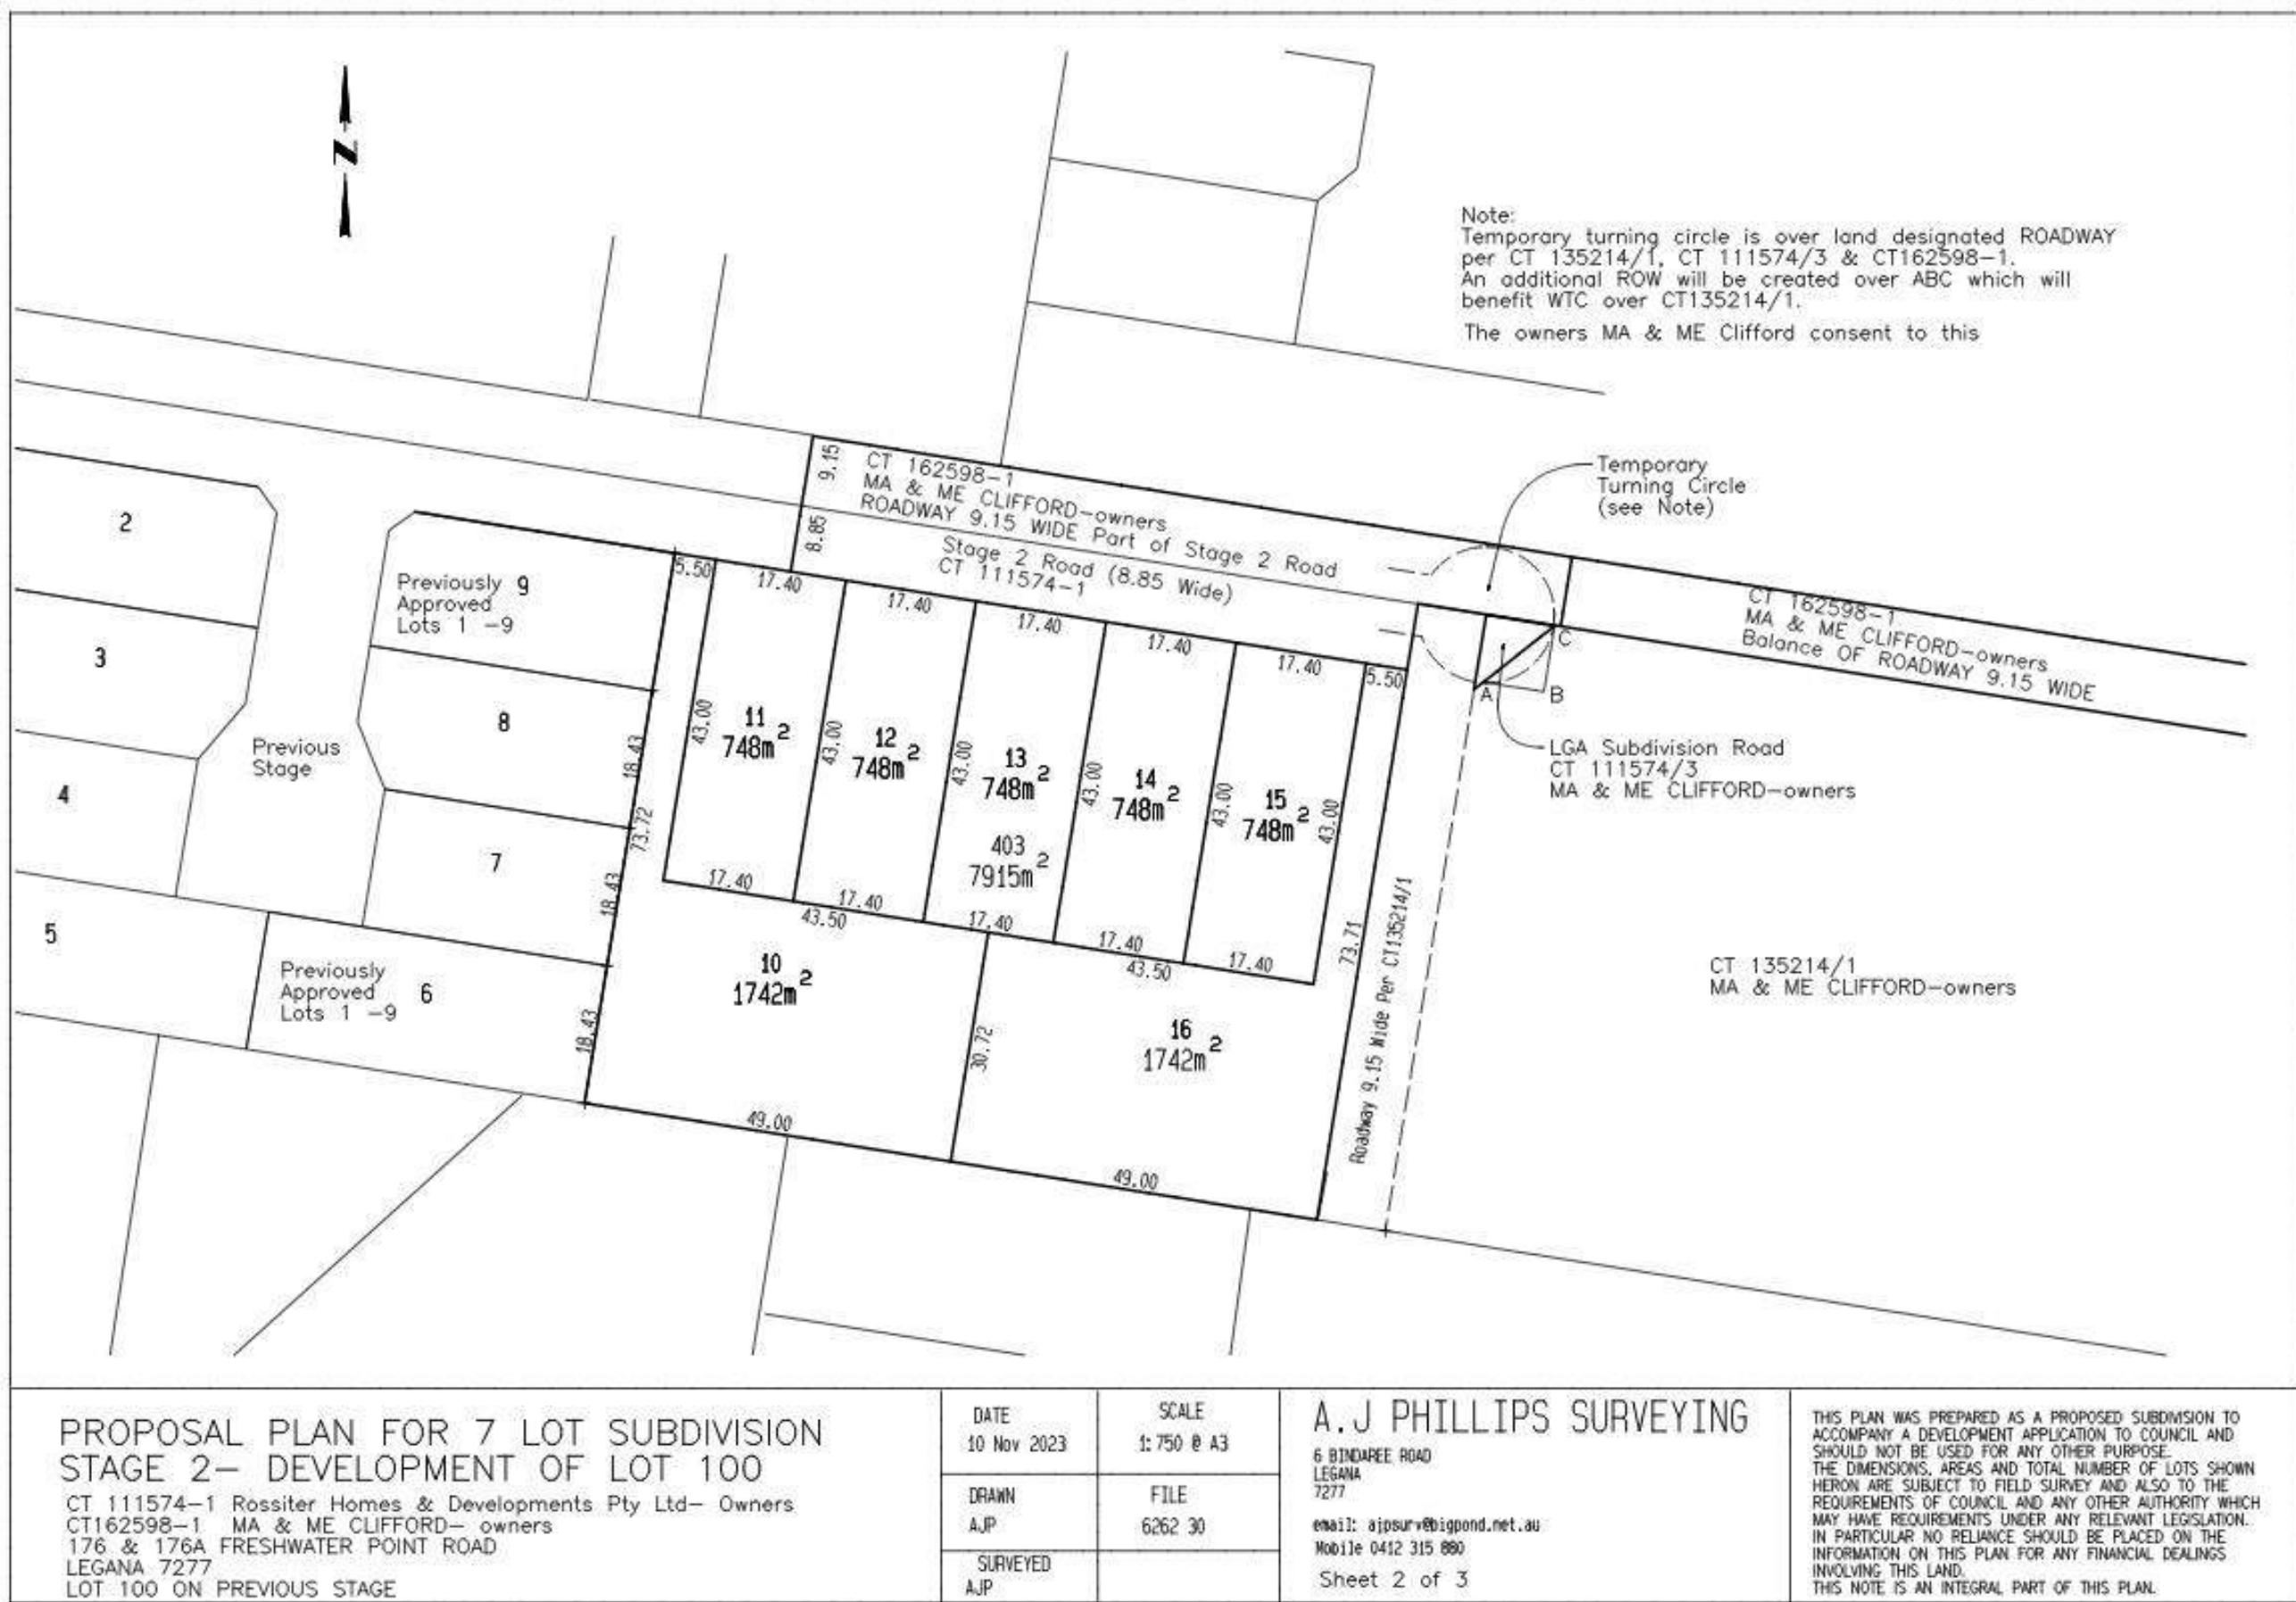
Site Plan for the proposed Stage 2 subdivision (lots 10-16) on 176 Freshwater Point Rd. Note the temporary turning circle proposed to be located on the subject site.
